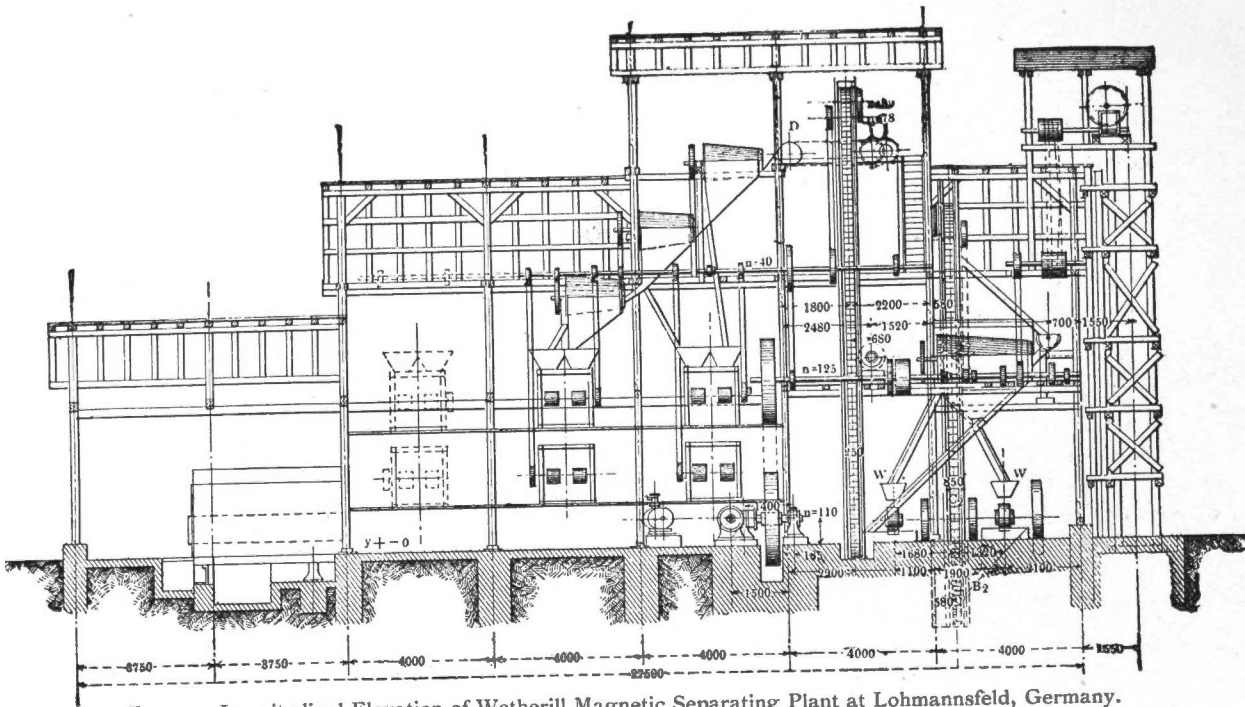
Longitudinal Elevation of Wetherill Magnetic Separating Plant at Lohmannsfeld, Germany.
